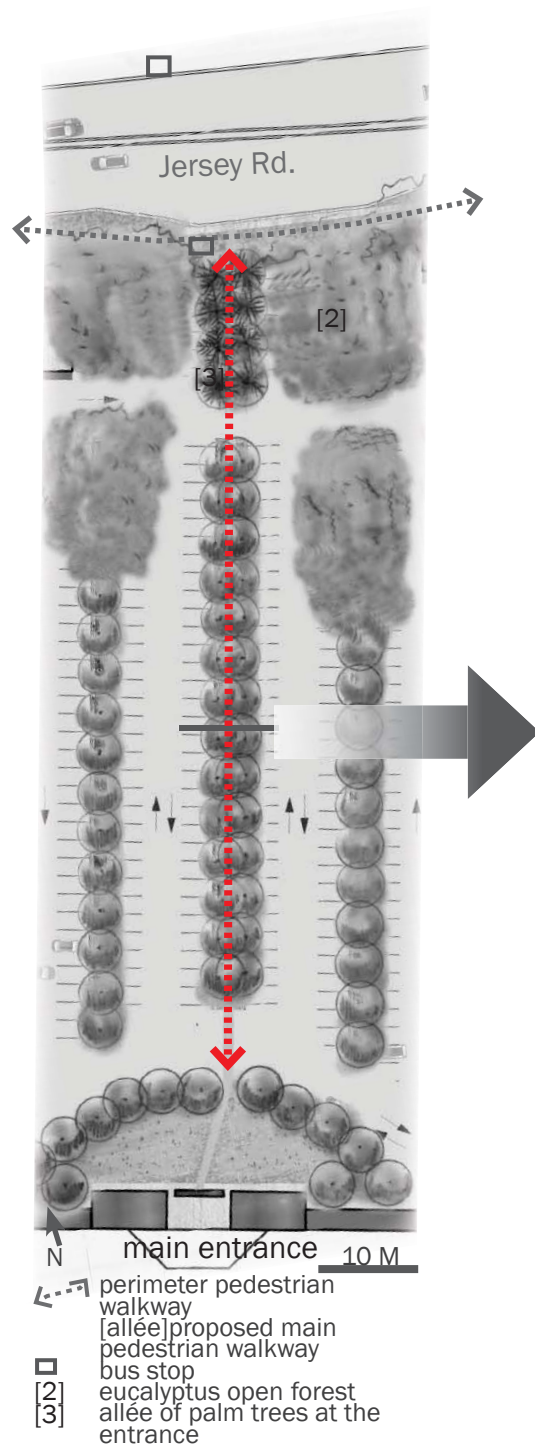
(a) Site Plan central allée / proposed main shaded walkway.
